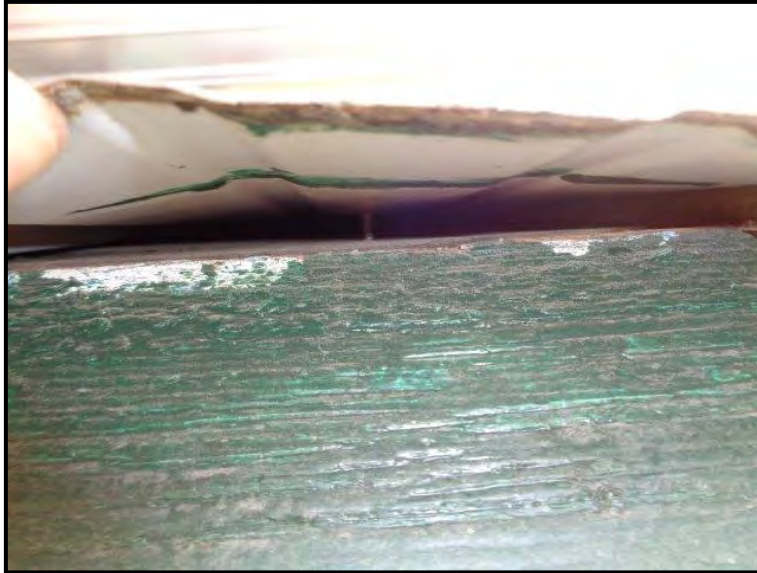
Roof Missing Underlay, Some Missing/Loose Fasteners
